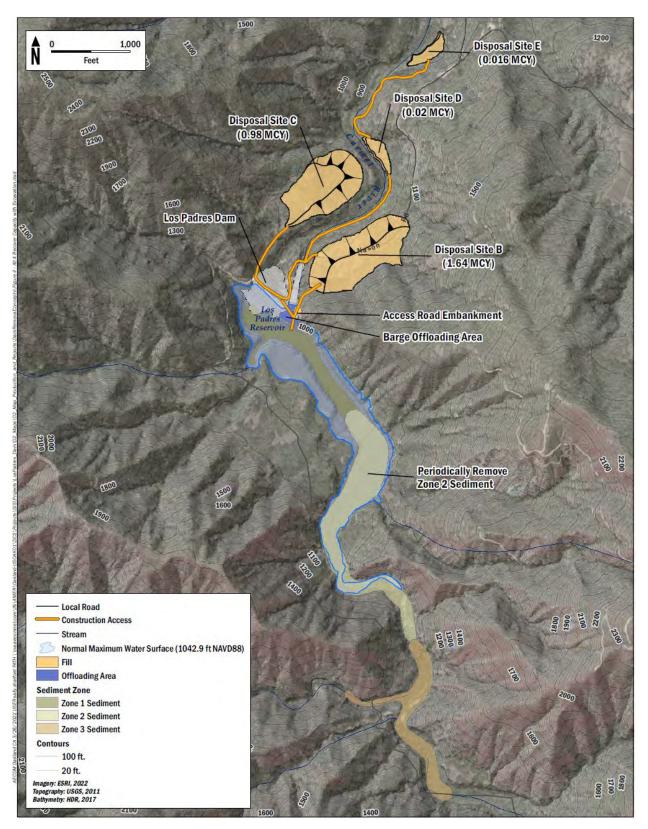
Alternative 4 (Recover Storage Capacity with Excavation)
